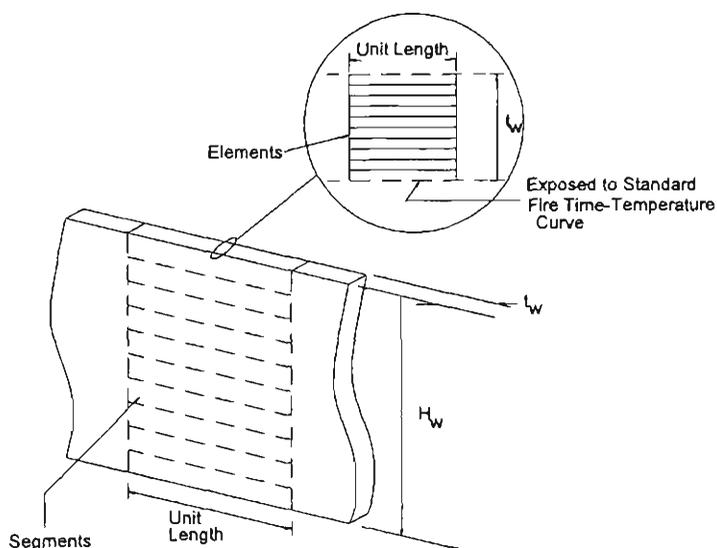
Discretisation of the Cantilevered Concrete Wall
